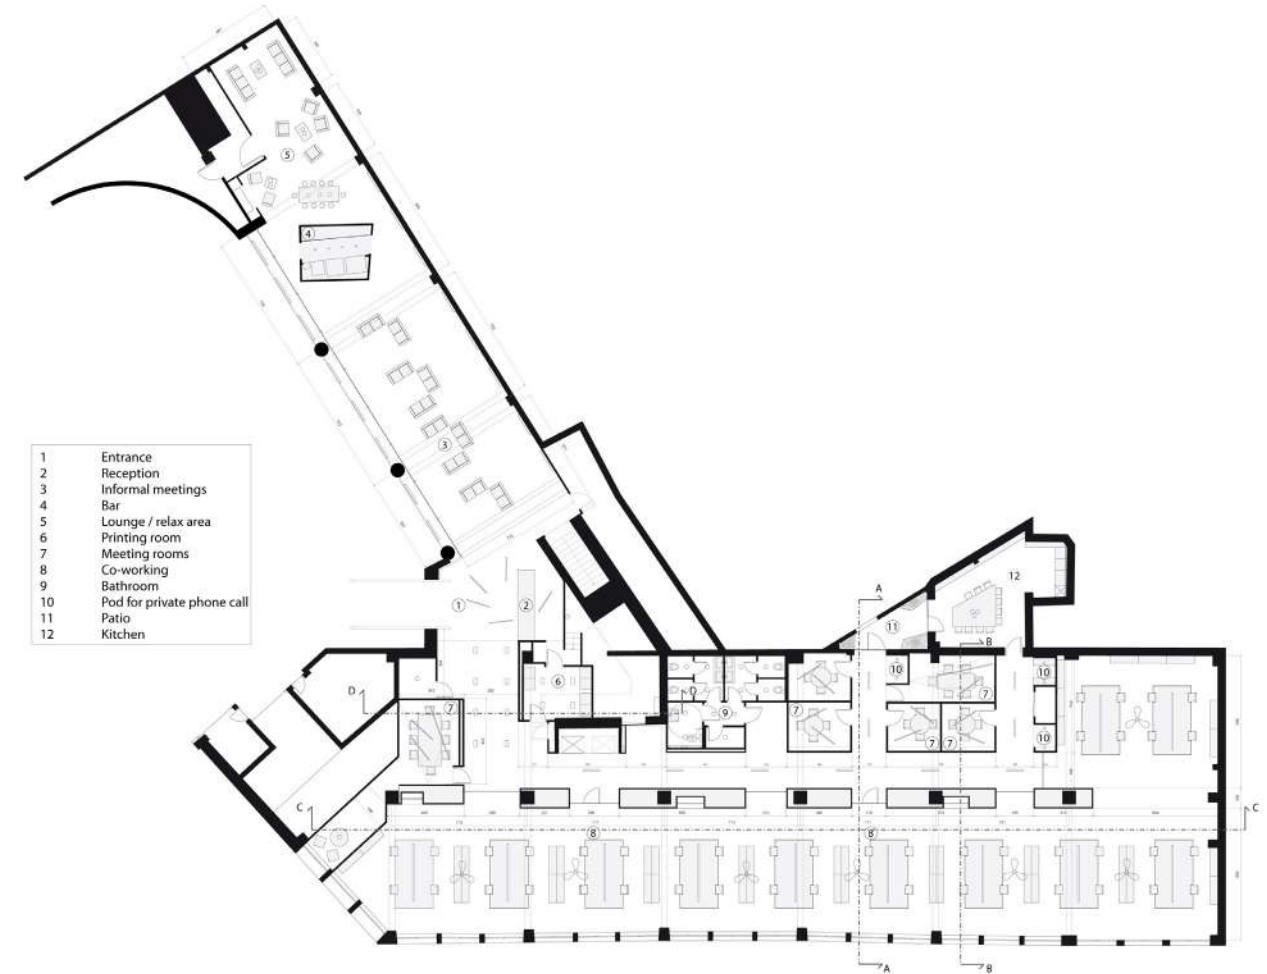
Toolbox coworking plan. Source: ArchDaily.
